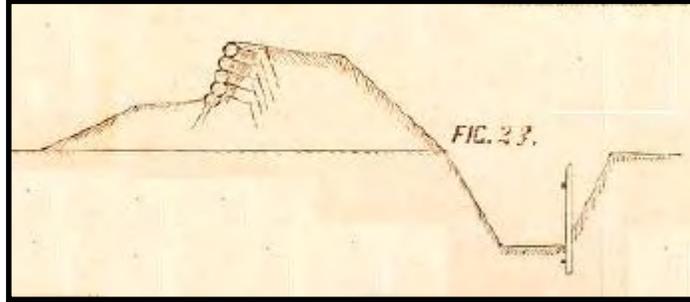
Profile of a parapet and trench earthwork with a fascine revetment and a palisade in its ditch (Mahan 1862:Plate IV).
